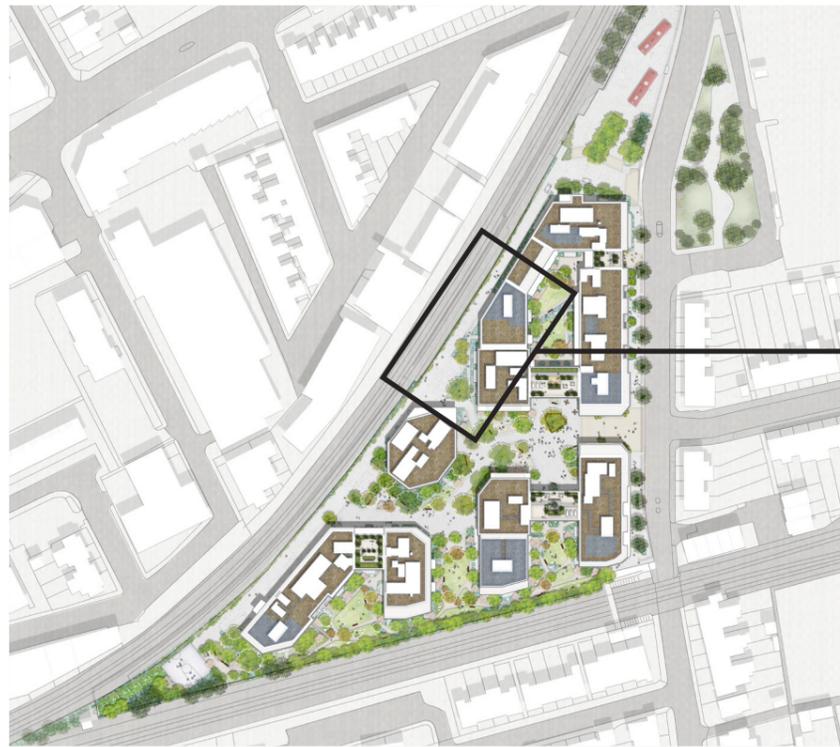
DETAIL OF BLOCK D STREETScape- AMENDED SCHEME
